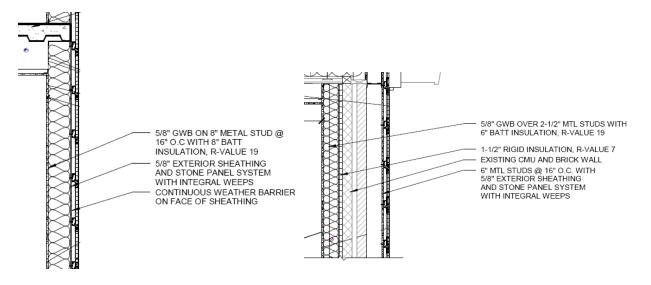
Typical Large Limestone Bumpout (left), and Small Limestone Bumpout connected to existing brick veneer (right)
